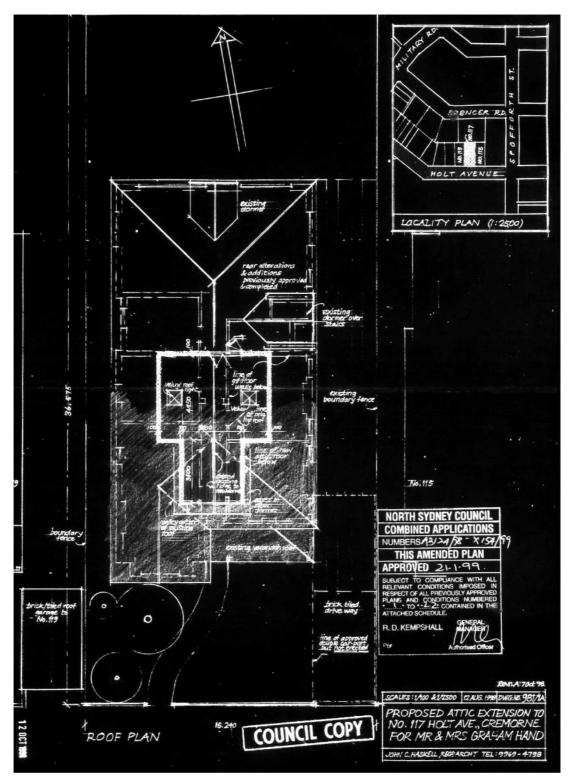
Roof plan—proposed attic extension to No. 117 Holt Ave, Cremorne, for Mr and Graham Hand, October 1998 / John C Haskell. (Source: North Sydney Council, Combined Applications A3/23/98 and ZX154/99)
